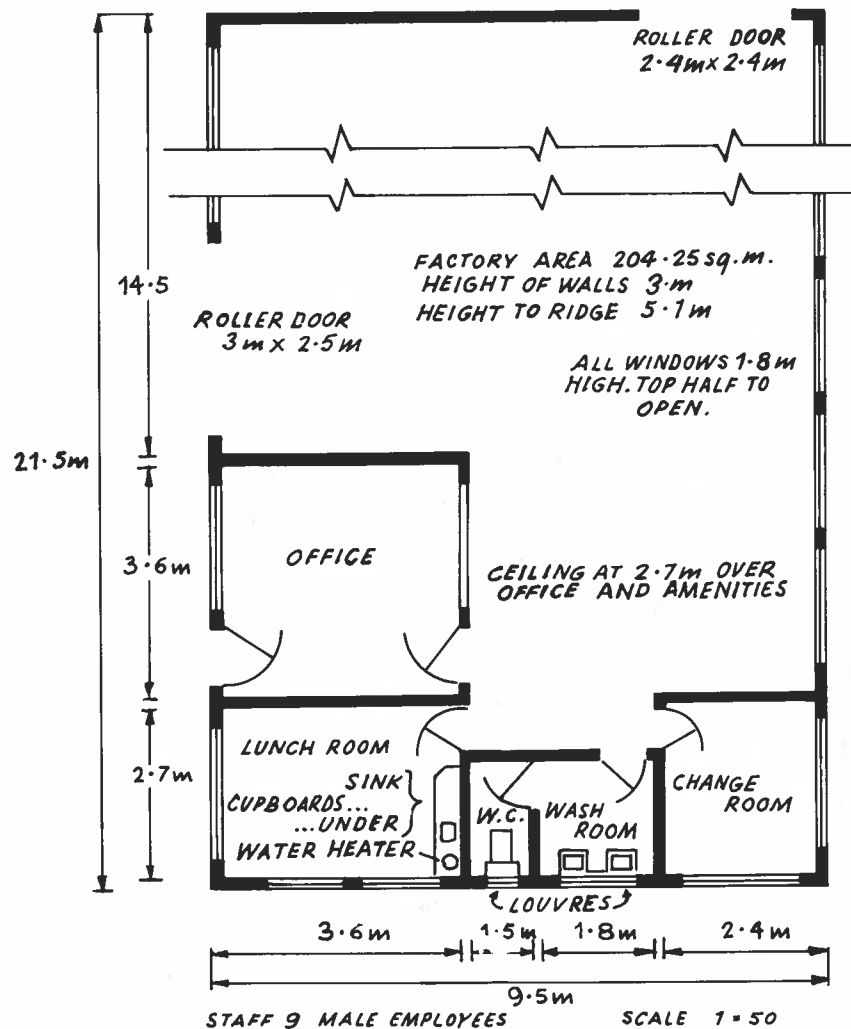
Specimen of type of plan to accompany application for registration. In the case of multi-storied buildings a plan of the relevant facilities on each floor will be necessary with an indication of normal and alternative means of access and egress. It is most desirable that a plan of proposed alterations to an existing factory be referred to the inspector to ensure that legislation is being complied with. As with initial planning, this procedure can save much unnecessary future expense and inconvenience. In such cases existing and intended buildings should be clearly shown.
